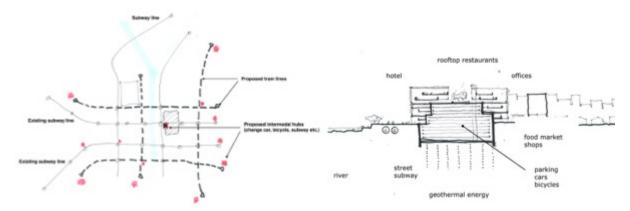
Diagram of Kyoto with proposed facilities. Figure 3: Section, new parking structure.
